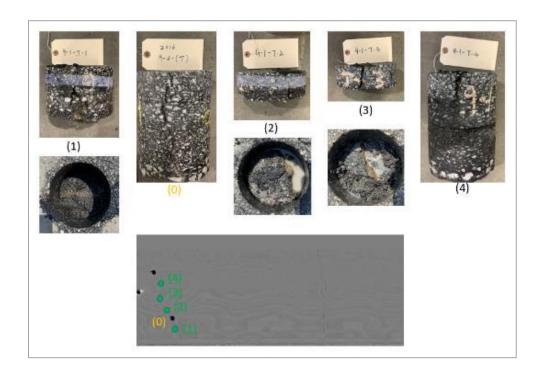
Photo. Transverse Crack, Non-sealed, Site 9
